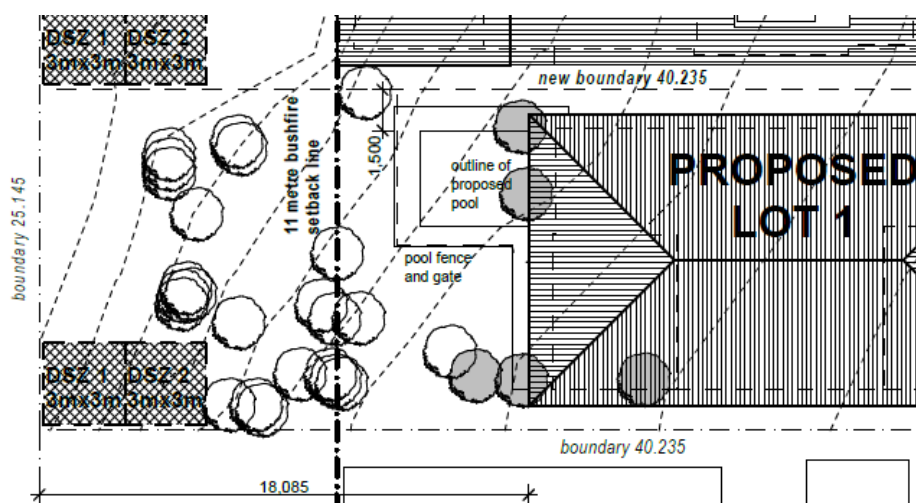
extract from Site Plan WD 0.03 Rev B – Tree Removal
